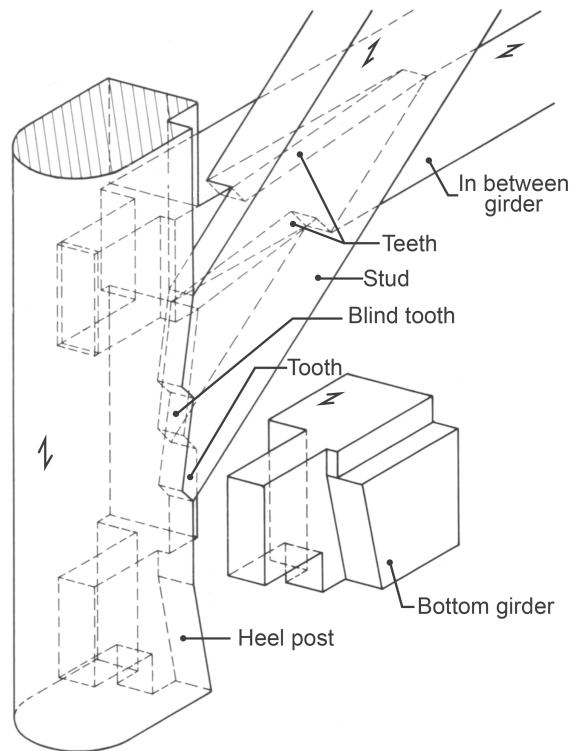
Inside view of the diagonal stud, girder and post connection (edited from [25], fig. 63.25)
